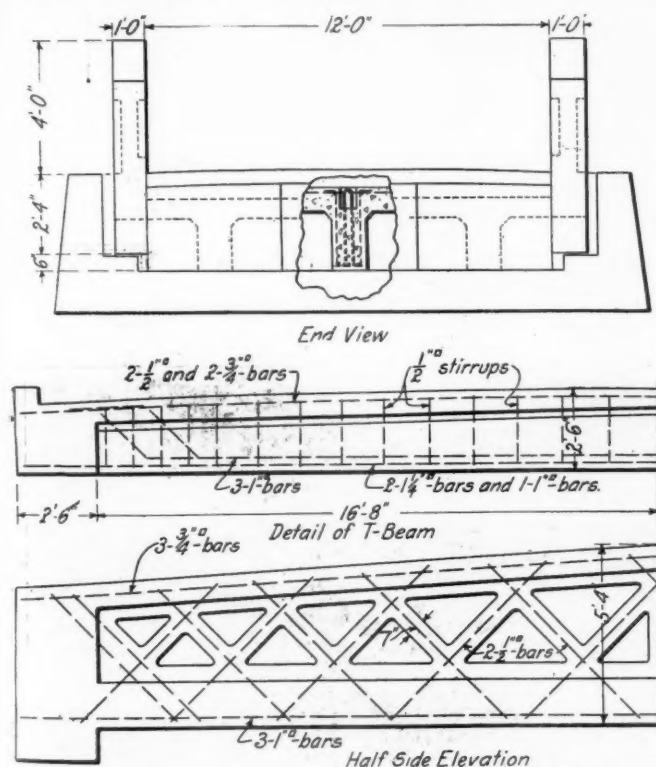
Precast Unit-Construction Is Well Adapted to Locations Where Traffic Interferes with the Use of Falsework
